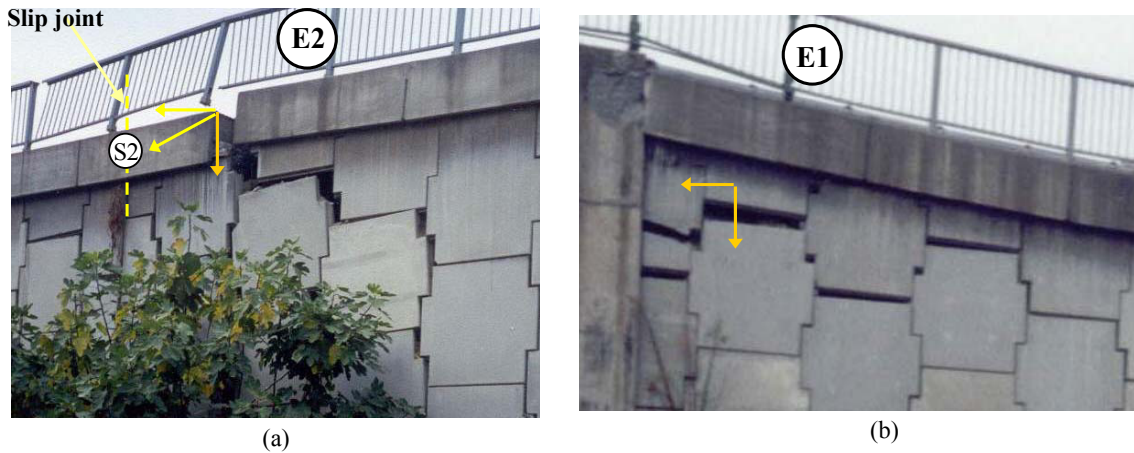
Damage details on eastern wall face (photos after Ozbakir).
